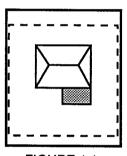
HOUSE AND LOT PLAN: BASIC FORM
